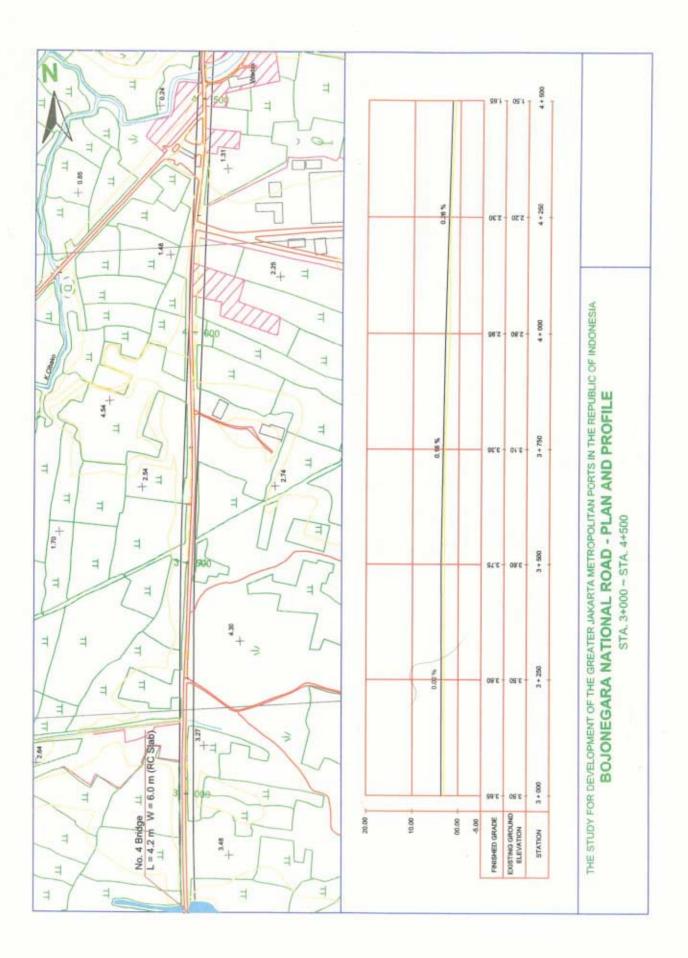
C-13 Bojonegara National Road Plan and Profile (8)
